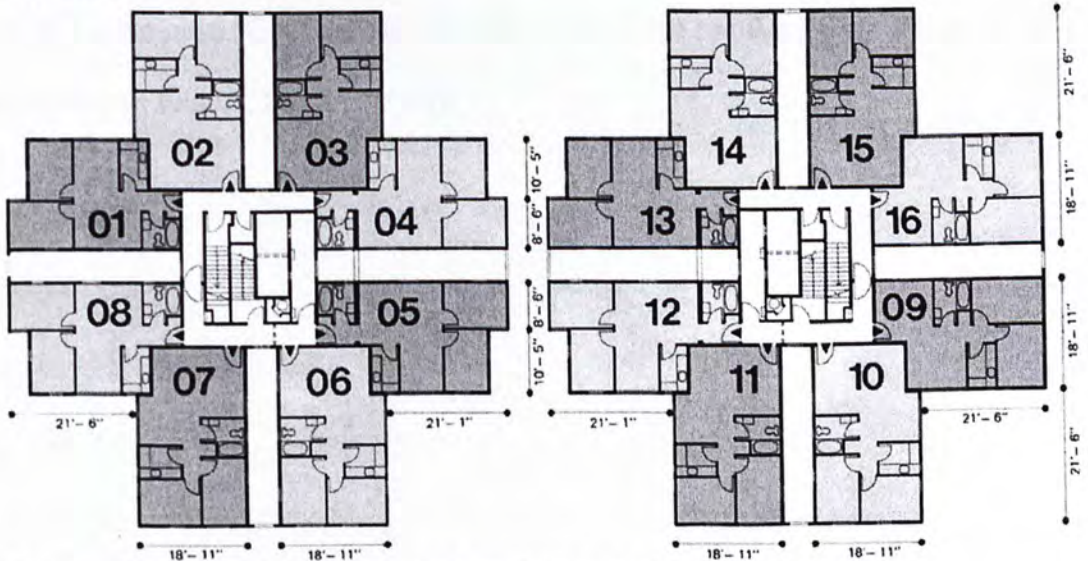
Figure for example 2 (Floor plan of “L-shape” and “Two-Rectangle” living room)⁴¹, Telford Garden
